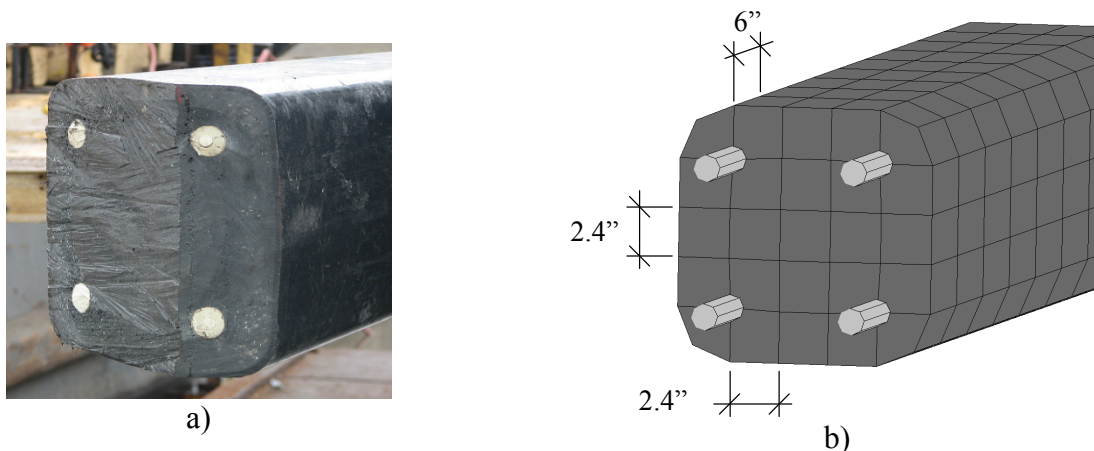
Recycled plastic beam with fiberglass reinforcing bars:
